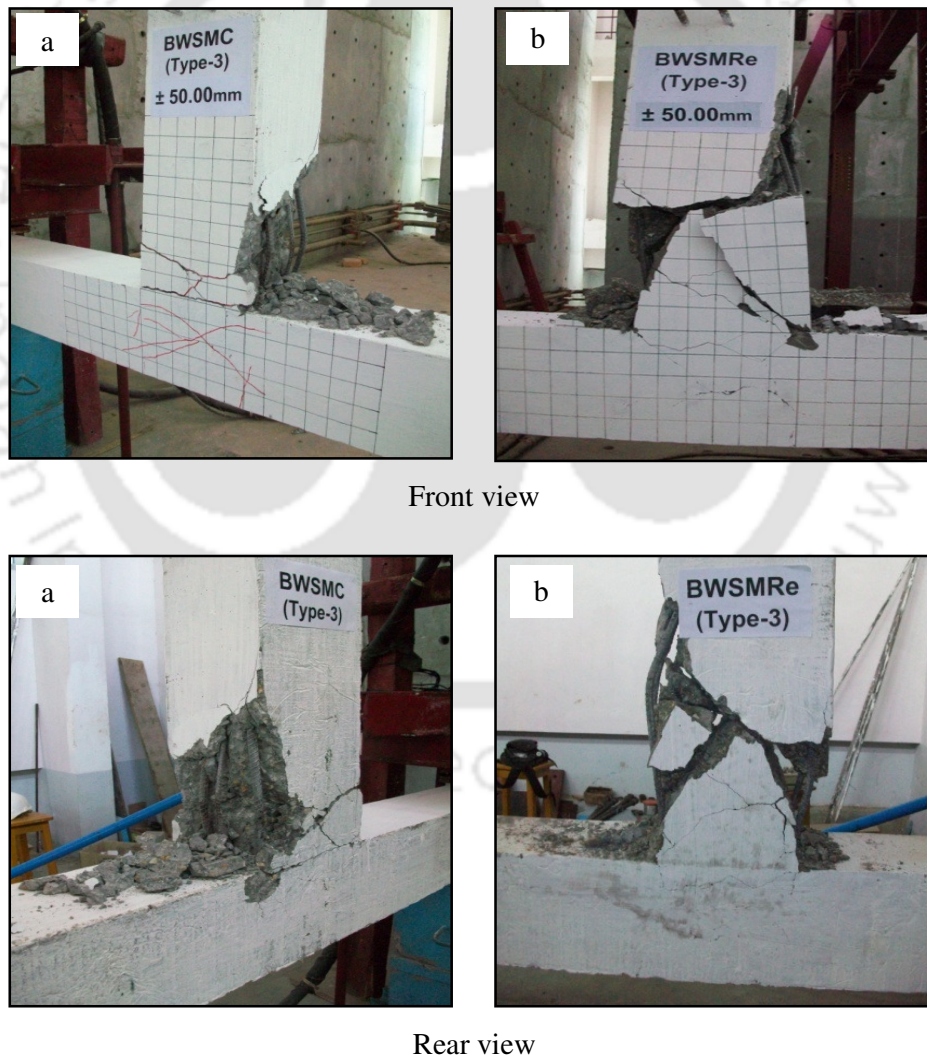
BWS specimens at the end of test under loading type-3:
